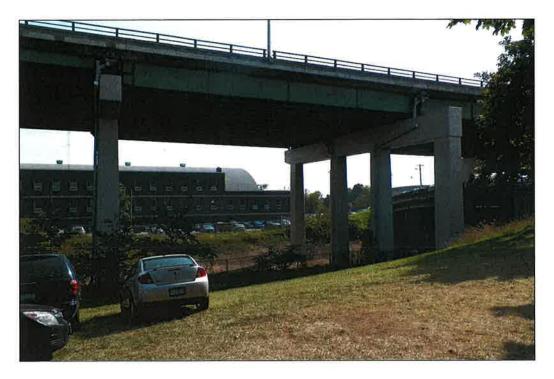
Elevation (Bent 53-55) (fair condition – stained and unstained cracking, delaminations, isolated spalls, patches, wet areas and light scaling)
